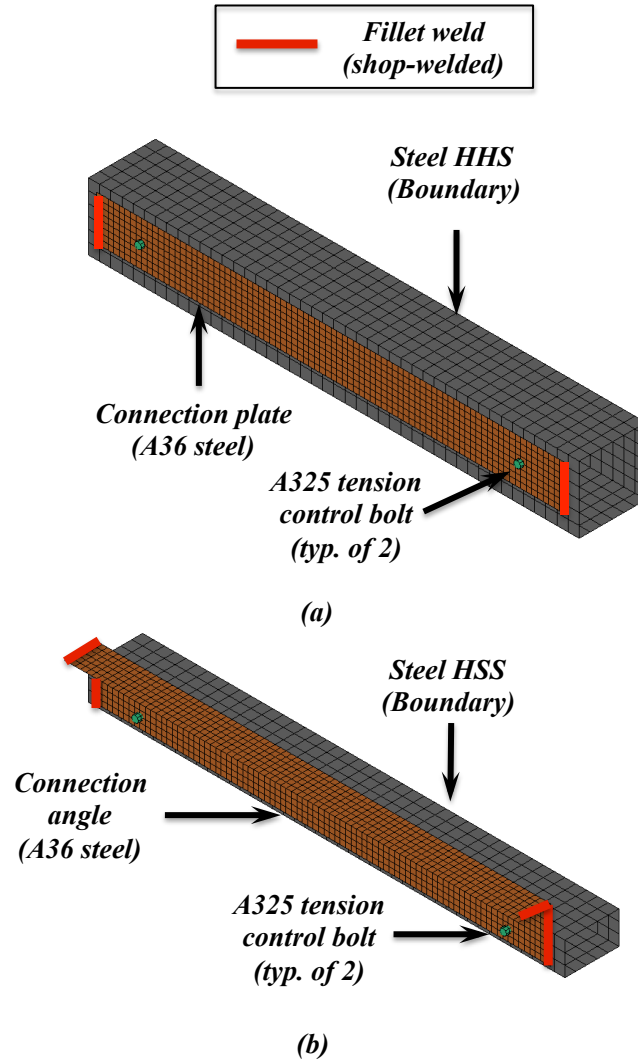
Finite element modeling of stair flight-to-building connections (Type-I connections): (a) upper flight, and (b) lower flight.
